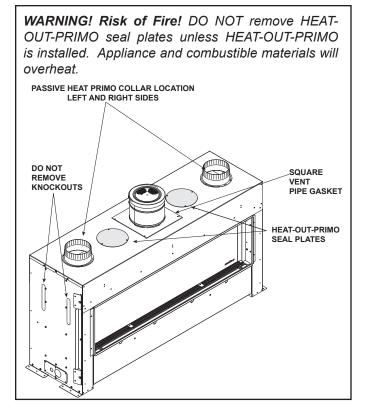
Remove PRIMO Passive Heat Seal Plates
